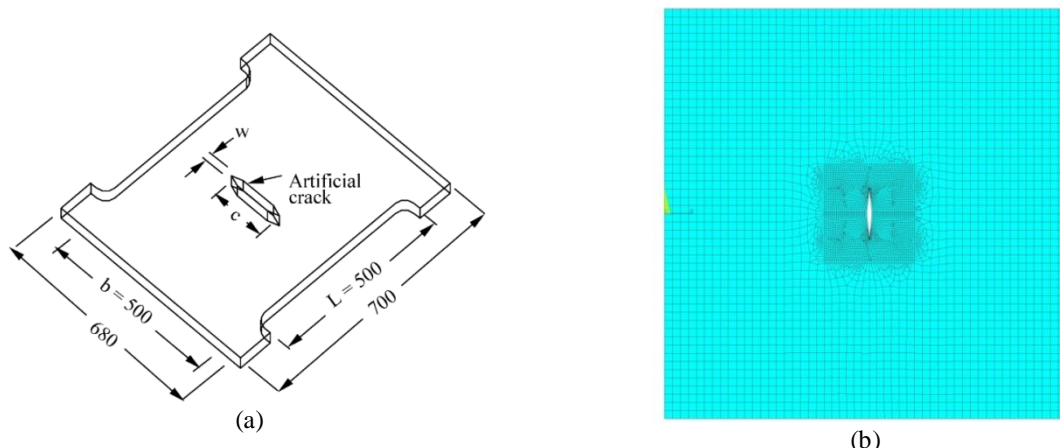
A schematic of a plate element of Paik tests with center crack and finite element model
